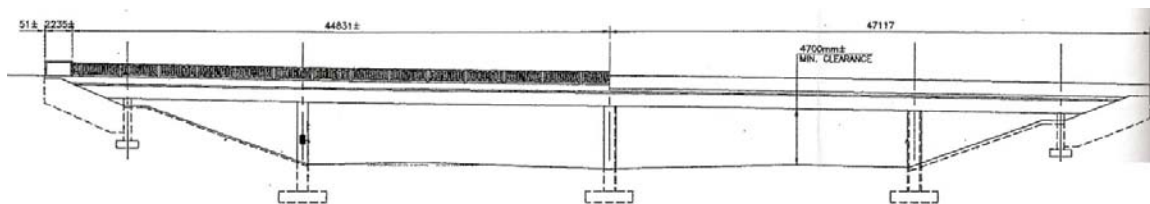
Elevation of Cedar Creek Road Underpass (Dillon Consulting 2001).
